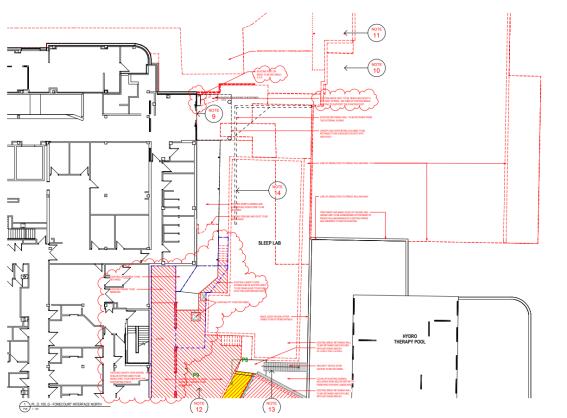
Burt Nelsen Wing Demolition Plan Sheet 2
